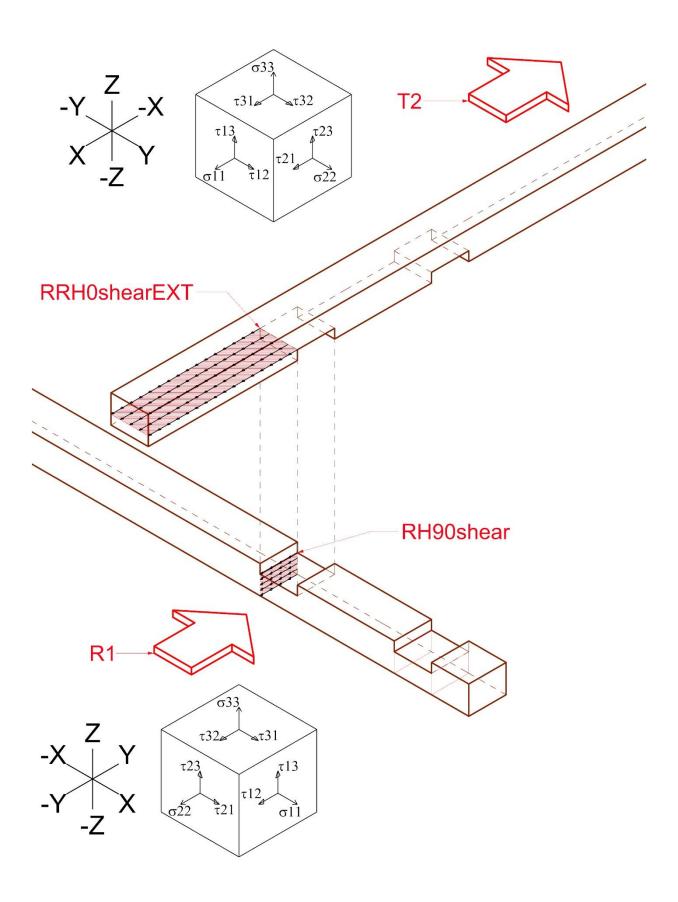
Roof Rafter Head Tangential stresses: Crossing rafters T2-R1
